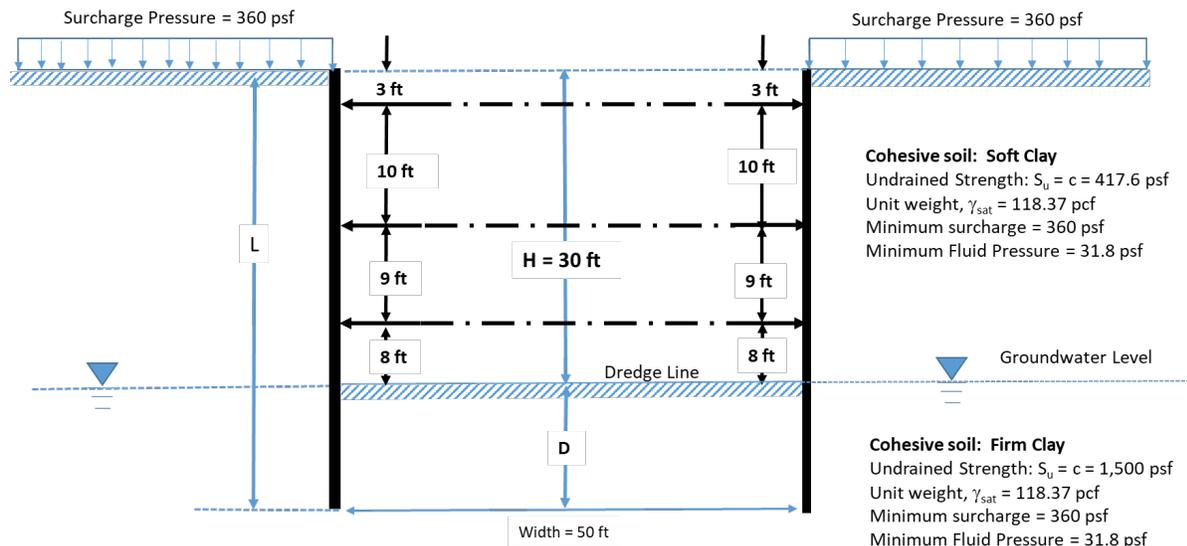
Case 8 Braced wall design parameters in cohesive soil.
